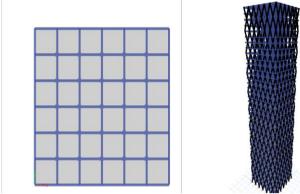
diagrid frame with symmetrical plan with a diagrid angle of 70.34°
